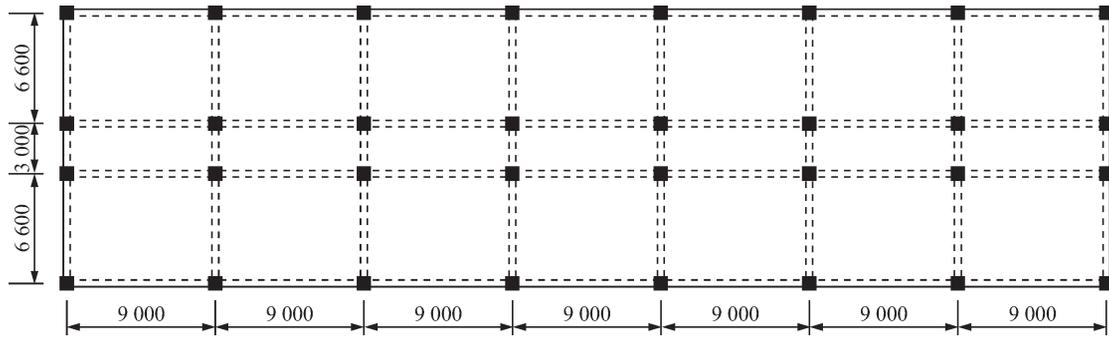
Structural layout plan of the teaching building (unit: mm)
